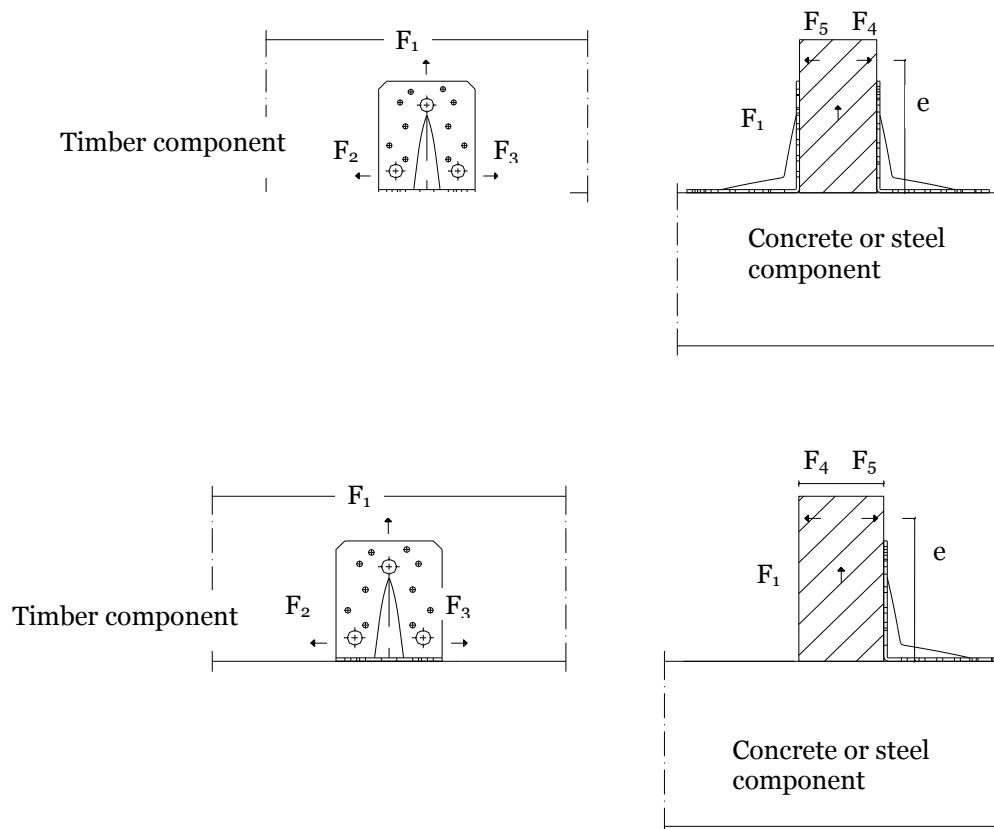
Definitions of forces, their directions and eccentricity for timber to concrete and timber to steel connections
